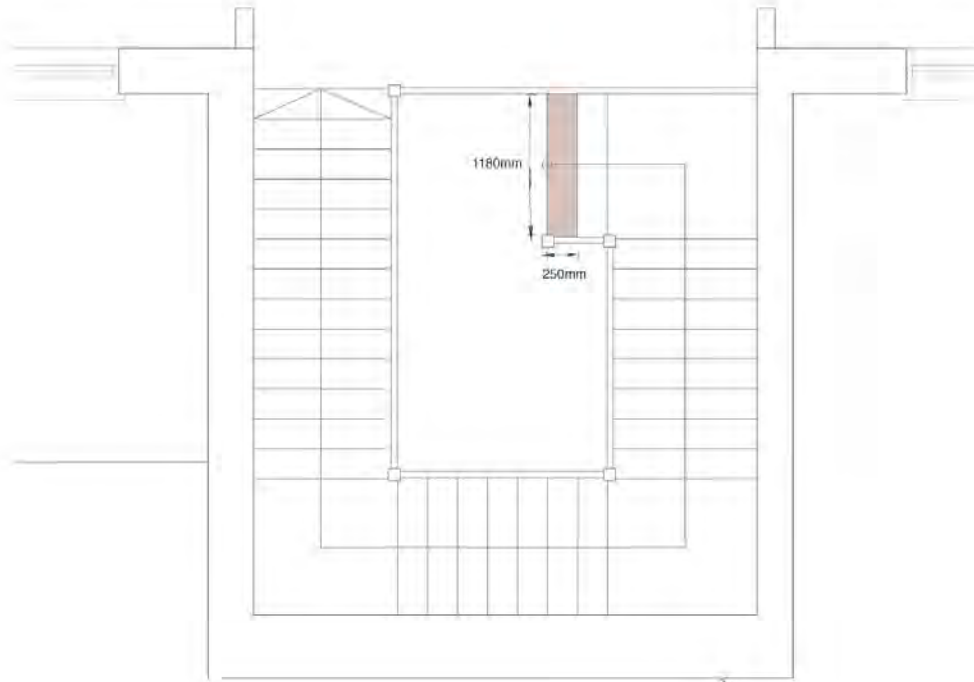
and 12 Additional railing added alongside the wall (secondary railing running under the existing and new one).
